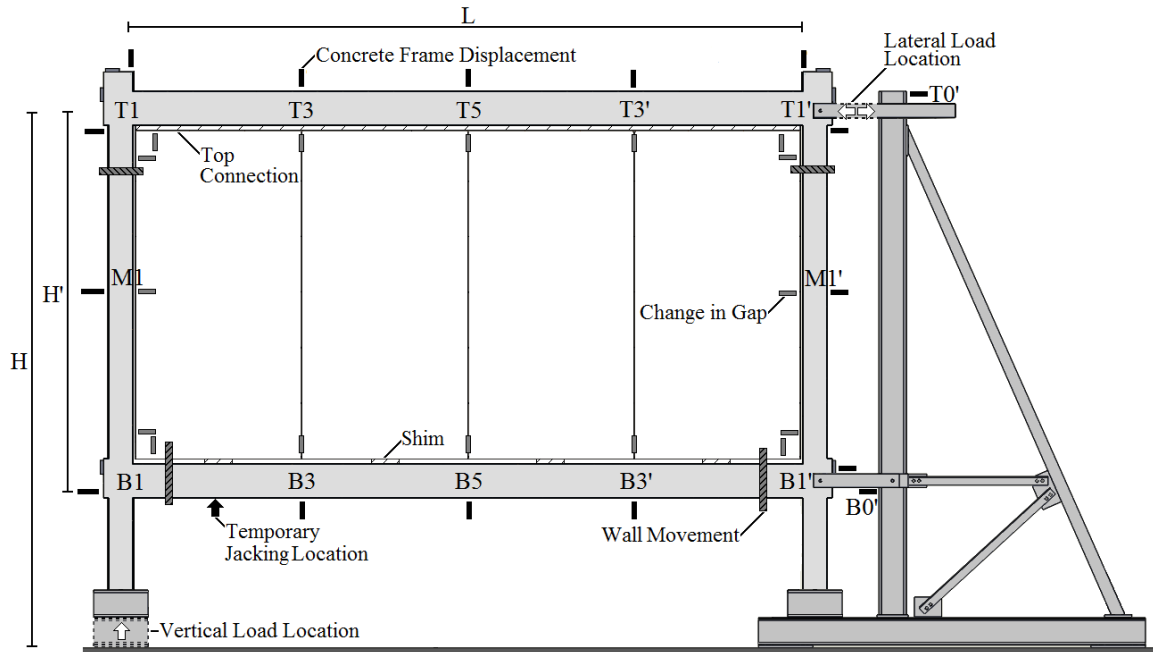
In-plane Instrumentation Location and Test Apparatus Details
